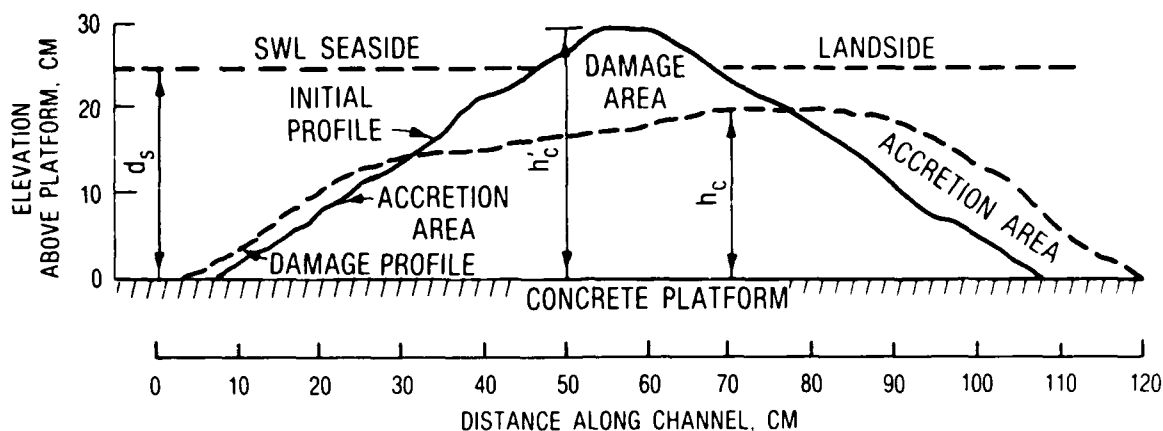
Cross-sectional view of initial and typical damaged reef profiles (swl denotes still-water level)
